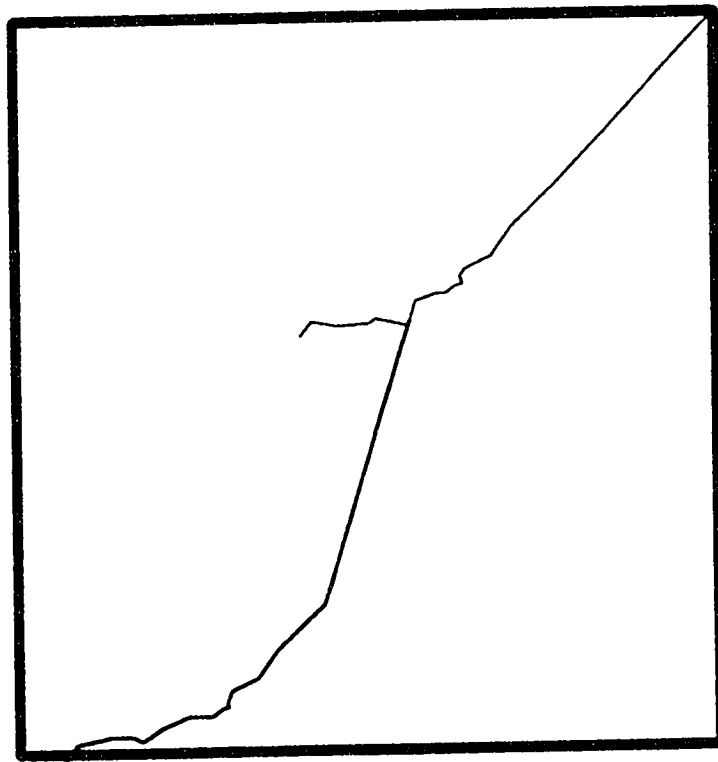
Typical Plastic Shrinkage Cracks in the Concrete Specimens Exposed to a RH of 50 % and Temperature of 55 °C
